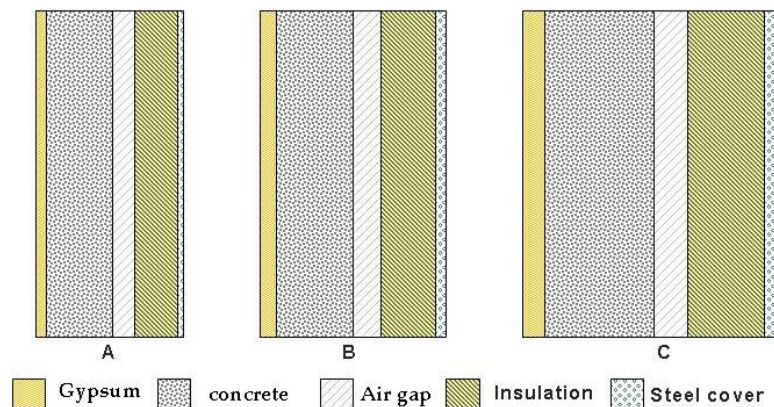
Show the three types of the wall (A) light-weight wall, (B) Medium-weight wall and (C) heavy-weight wall.
